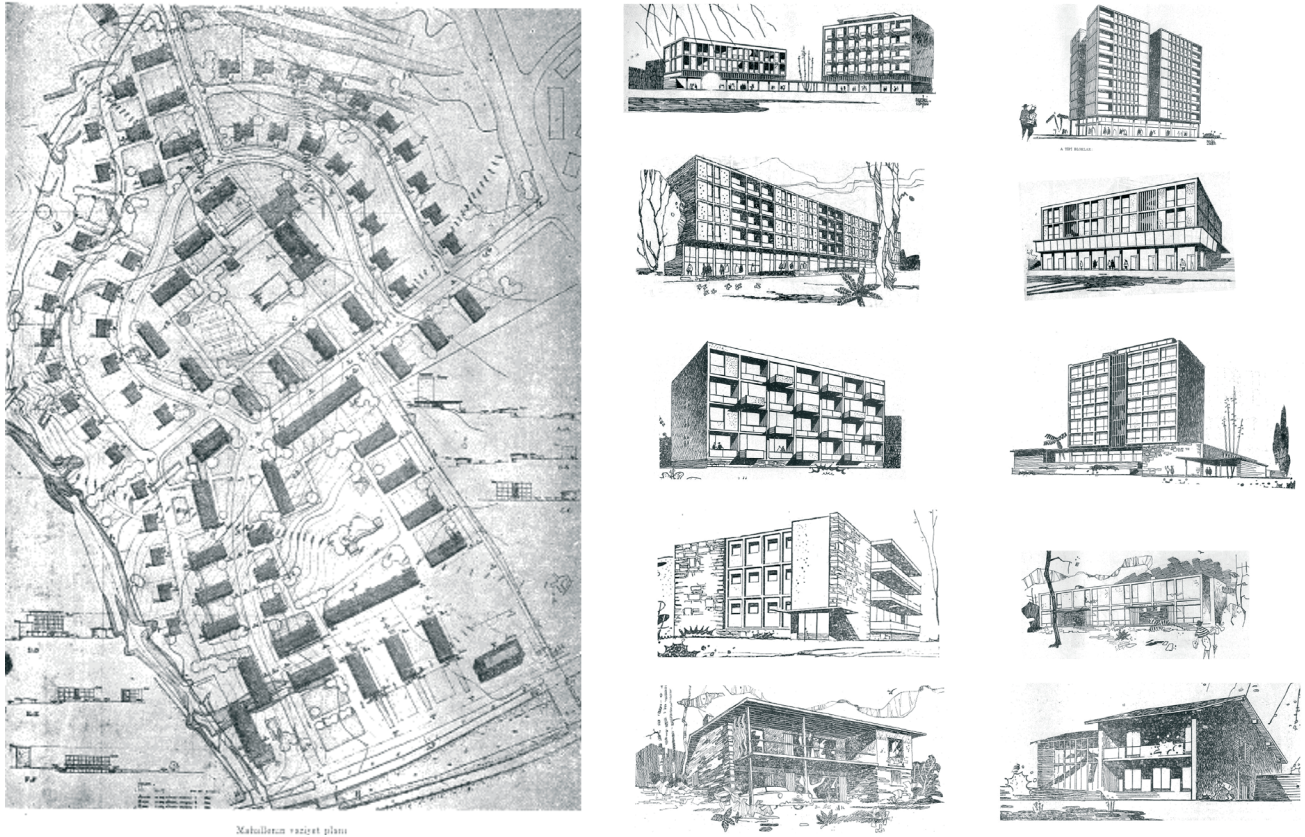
Levent 4 Neighborhood Site Plan and Perspective drawings (arranged by author based on Arü,1956)
